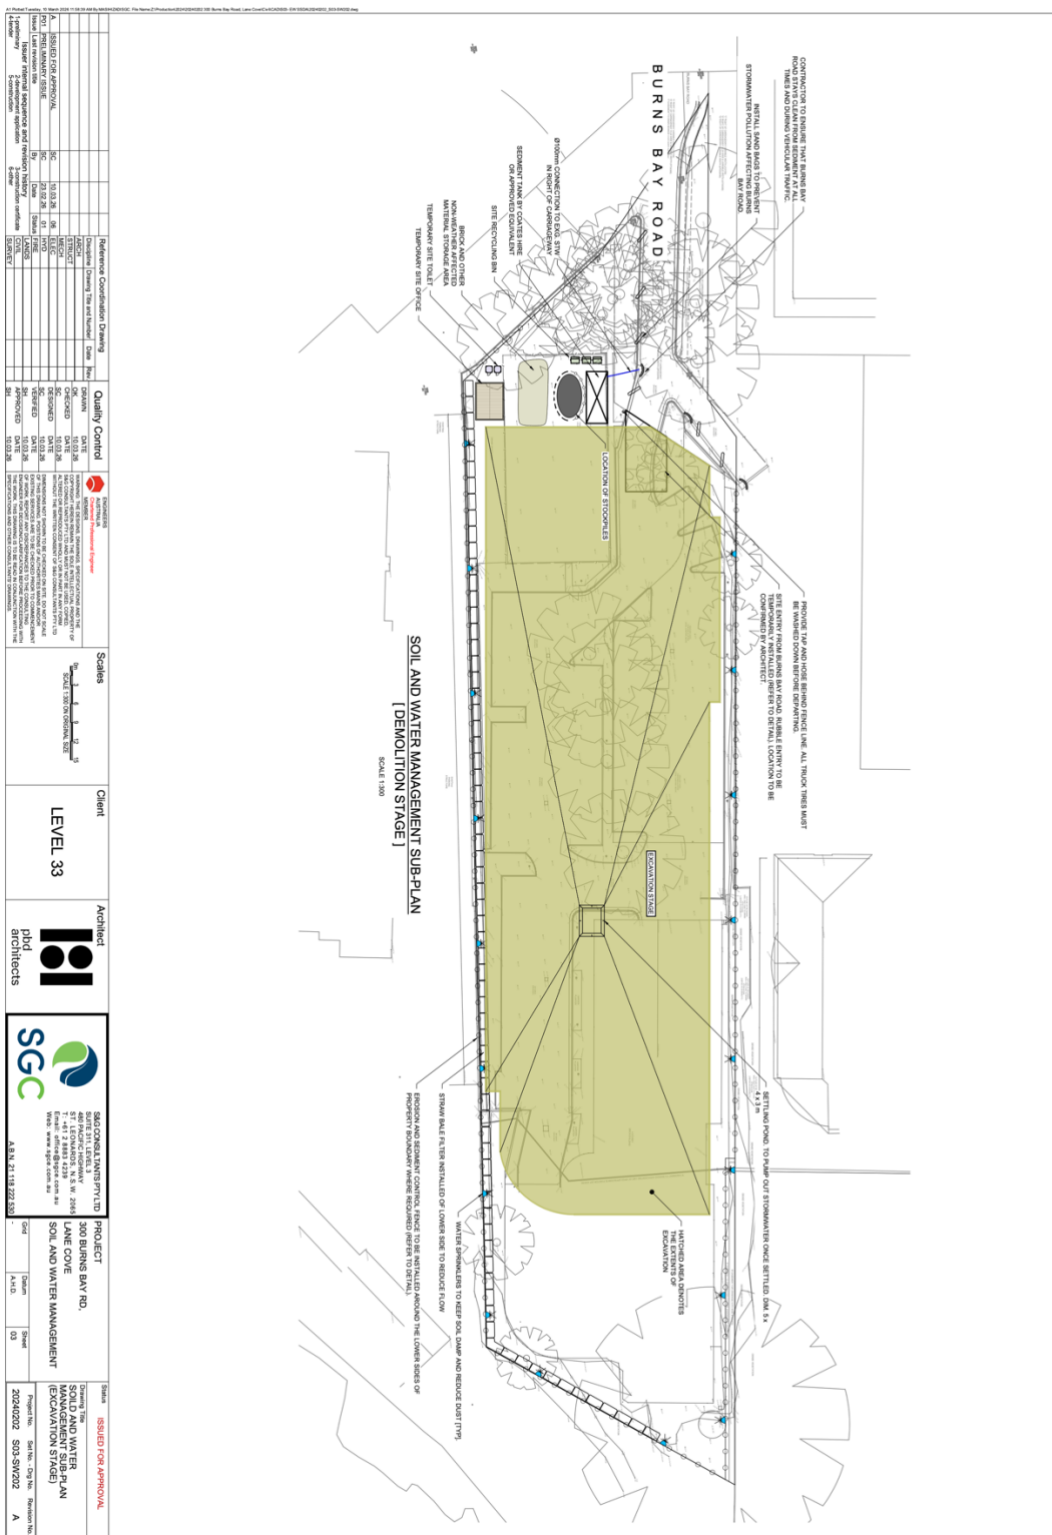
Soil and Water Management plan (Excavation Stage)
